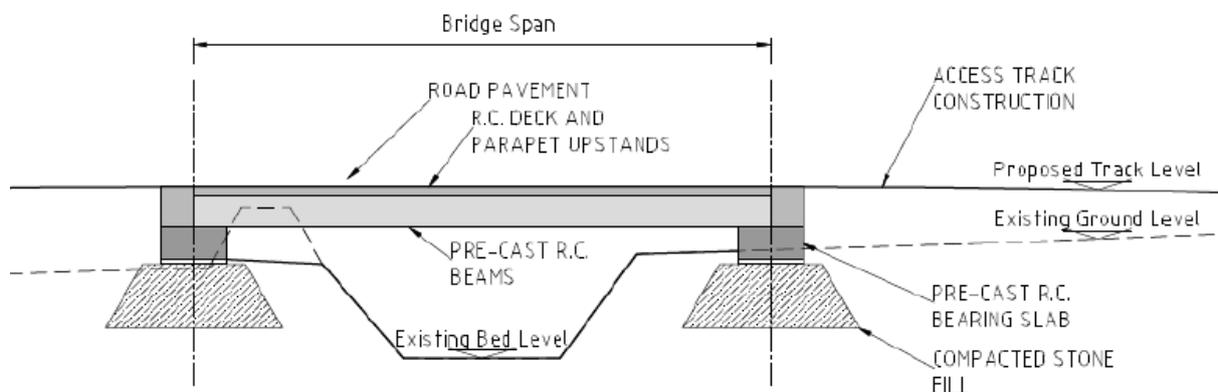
Cross Section of Typical Stream / Deck Crossing
